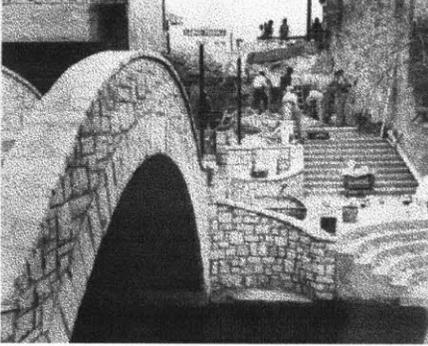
Construction of stairway access to the River Walk from the street. (Zunker)
